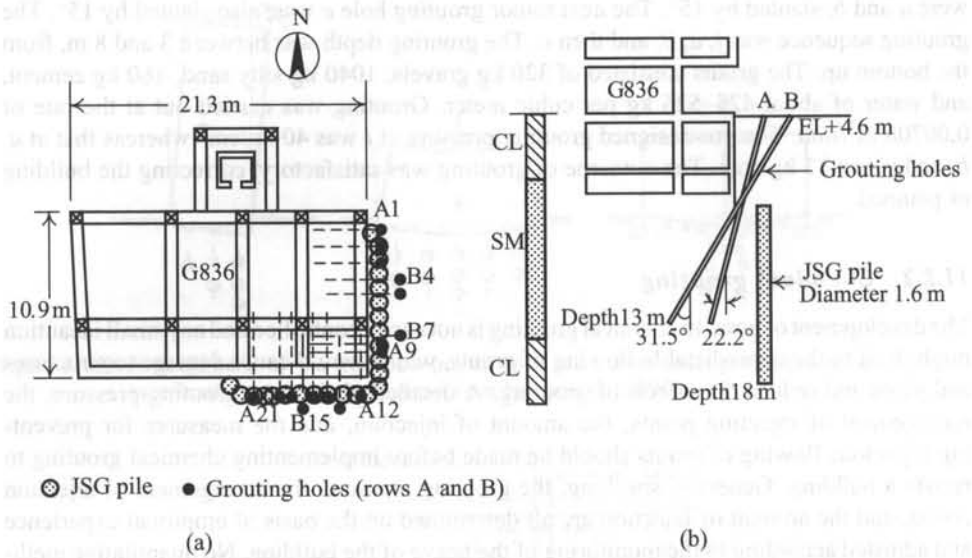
Case of building rectification by the chemical grouting method: (a) plan and (b) excavation and geological profile (note: A9 stands for the ninth grouting point in row A and B7 the seventh grouting point in row B, etc) (Chu and Chou, 1998).
